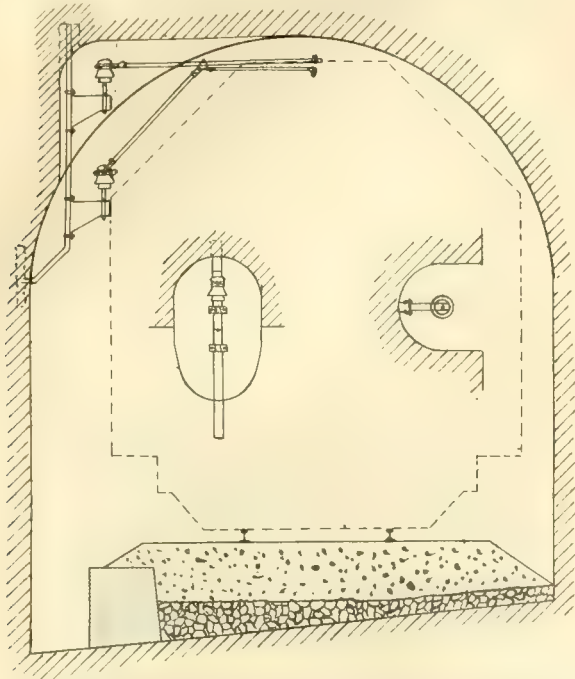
TYPICAL TROLLEY WIRE SUSPENSION IN A TUNNEL
